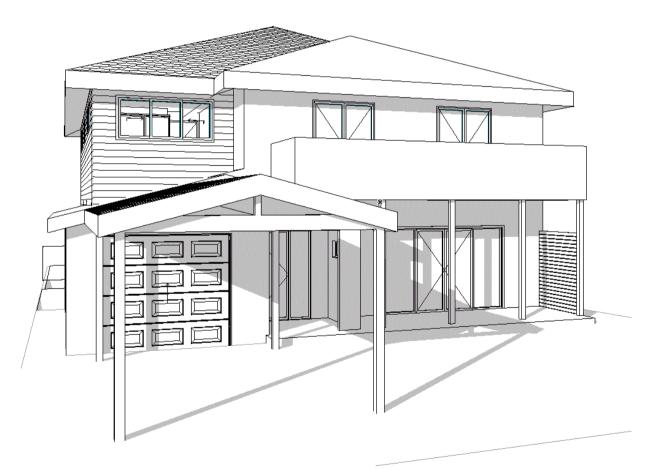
Proposed works at No. 5 Wyadra Avenue. (Action Plans 2019).
